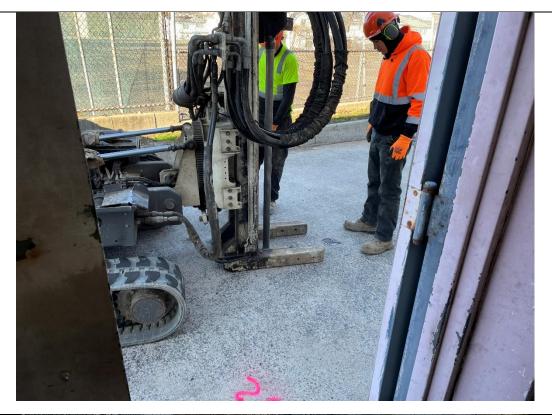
View of AARCO hand clearing to 6 feet, facing northwest.
